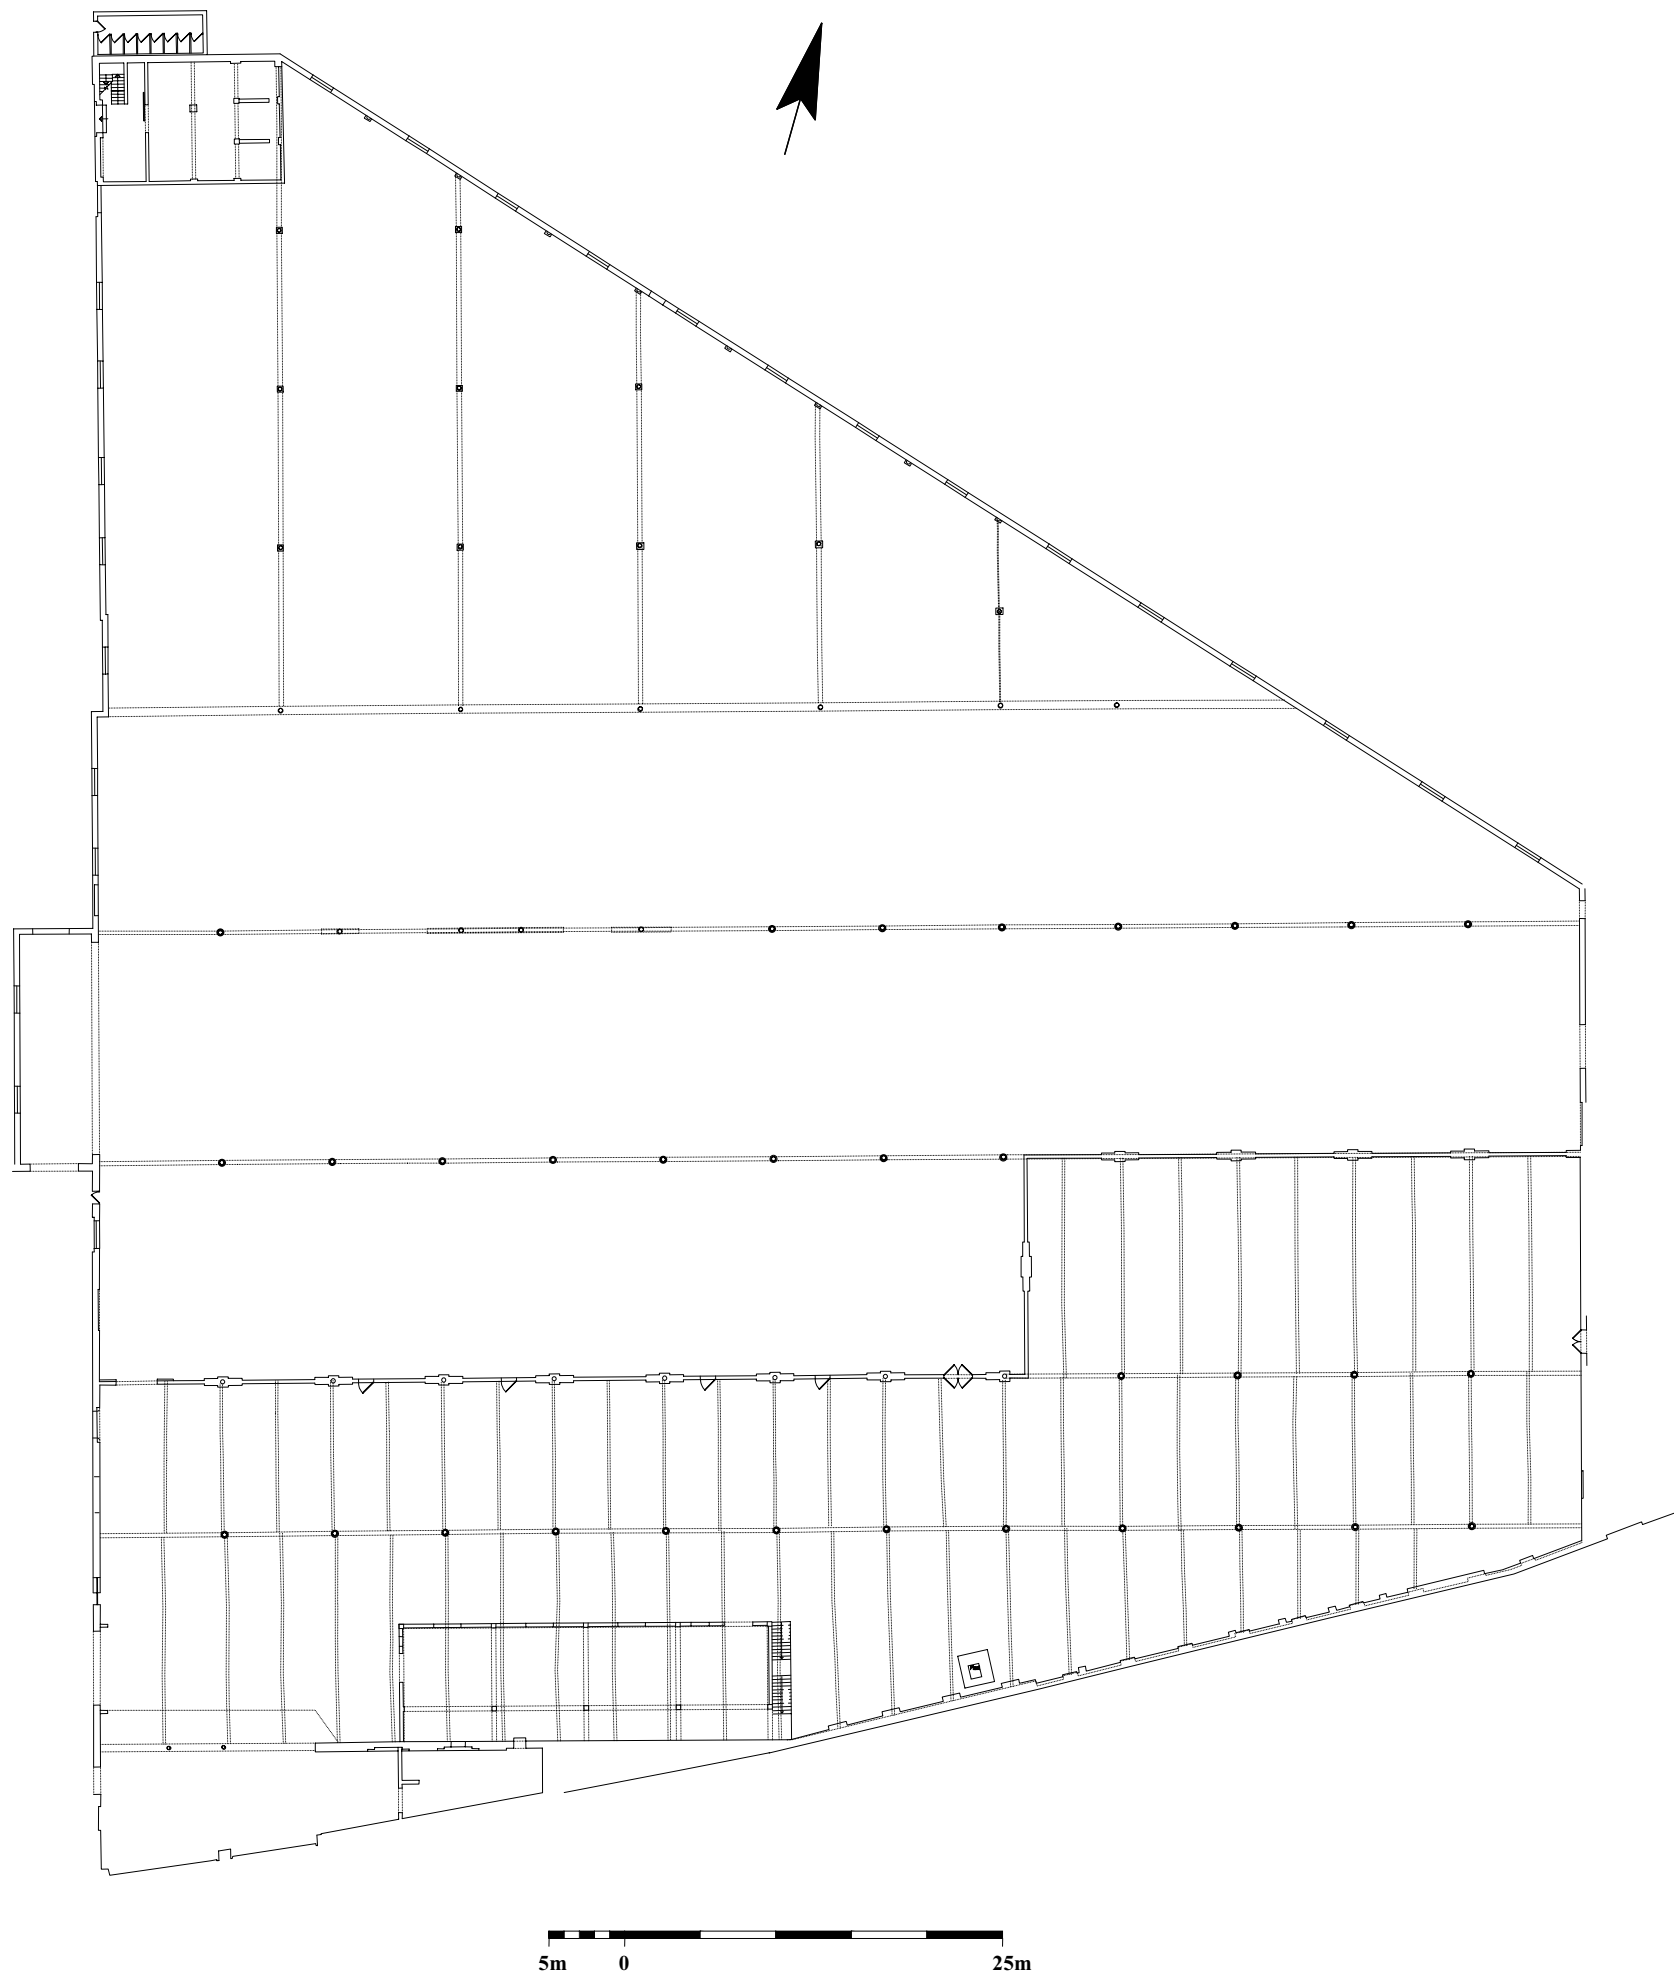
Triangular building plan 11887 (based on drawing ref: Triangle building floorplans
